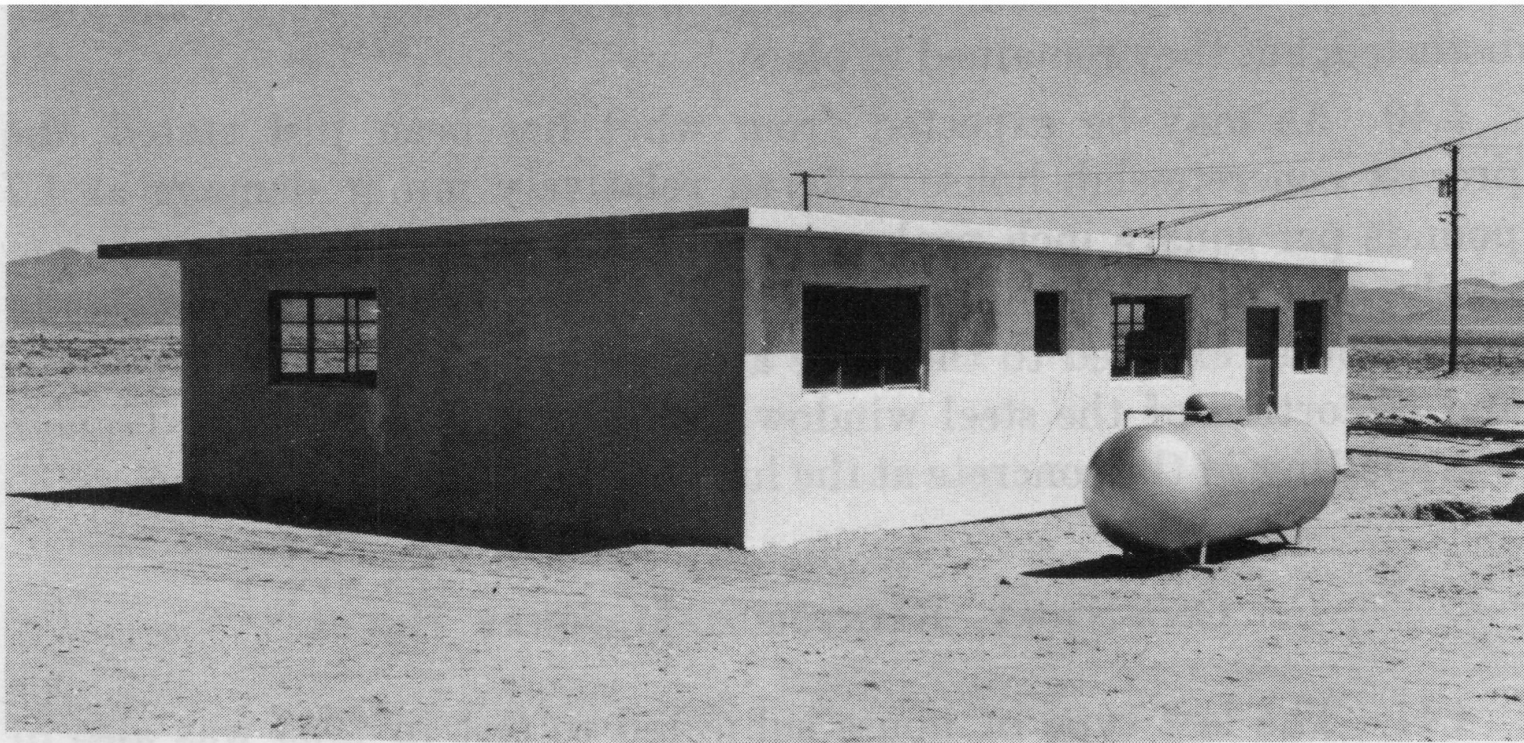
Reinforced precast concrete house before a nuclear explosion, Nevada Test Site.
